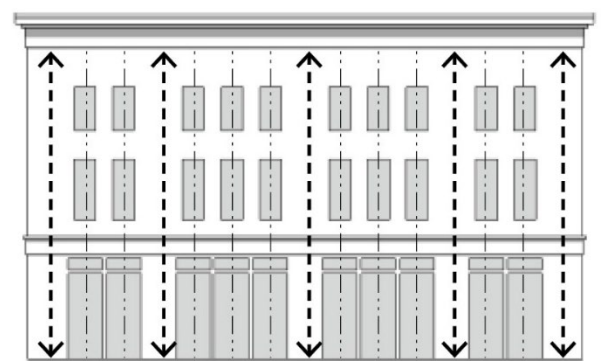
f.1.ii: Structural and fenestration centerlines, showing how the solid and voids in the facade align vertically.
